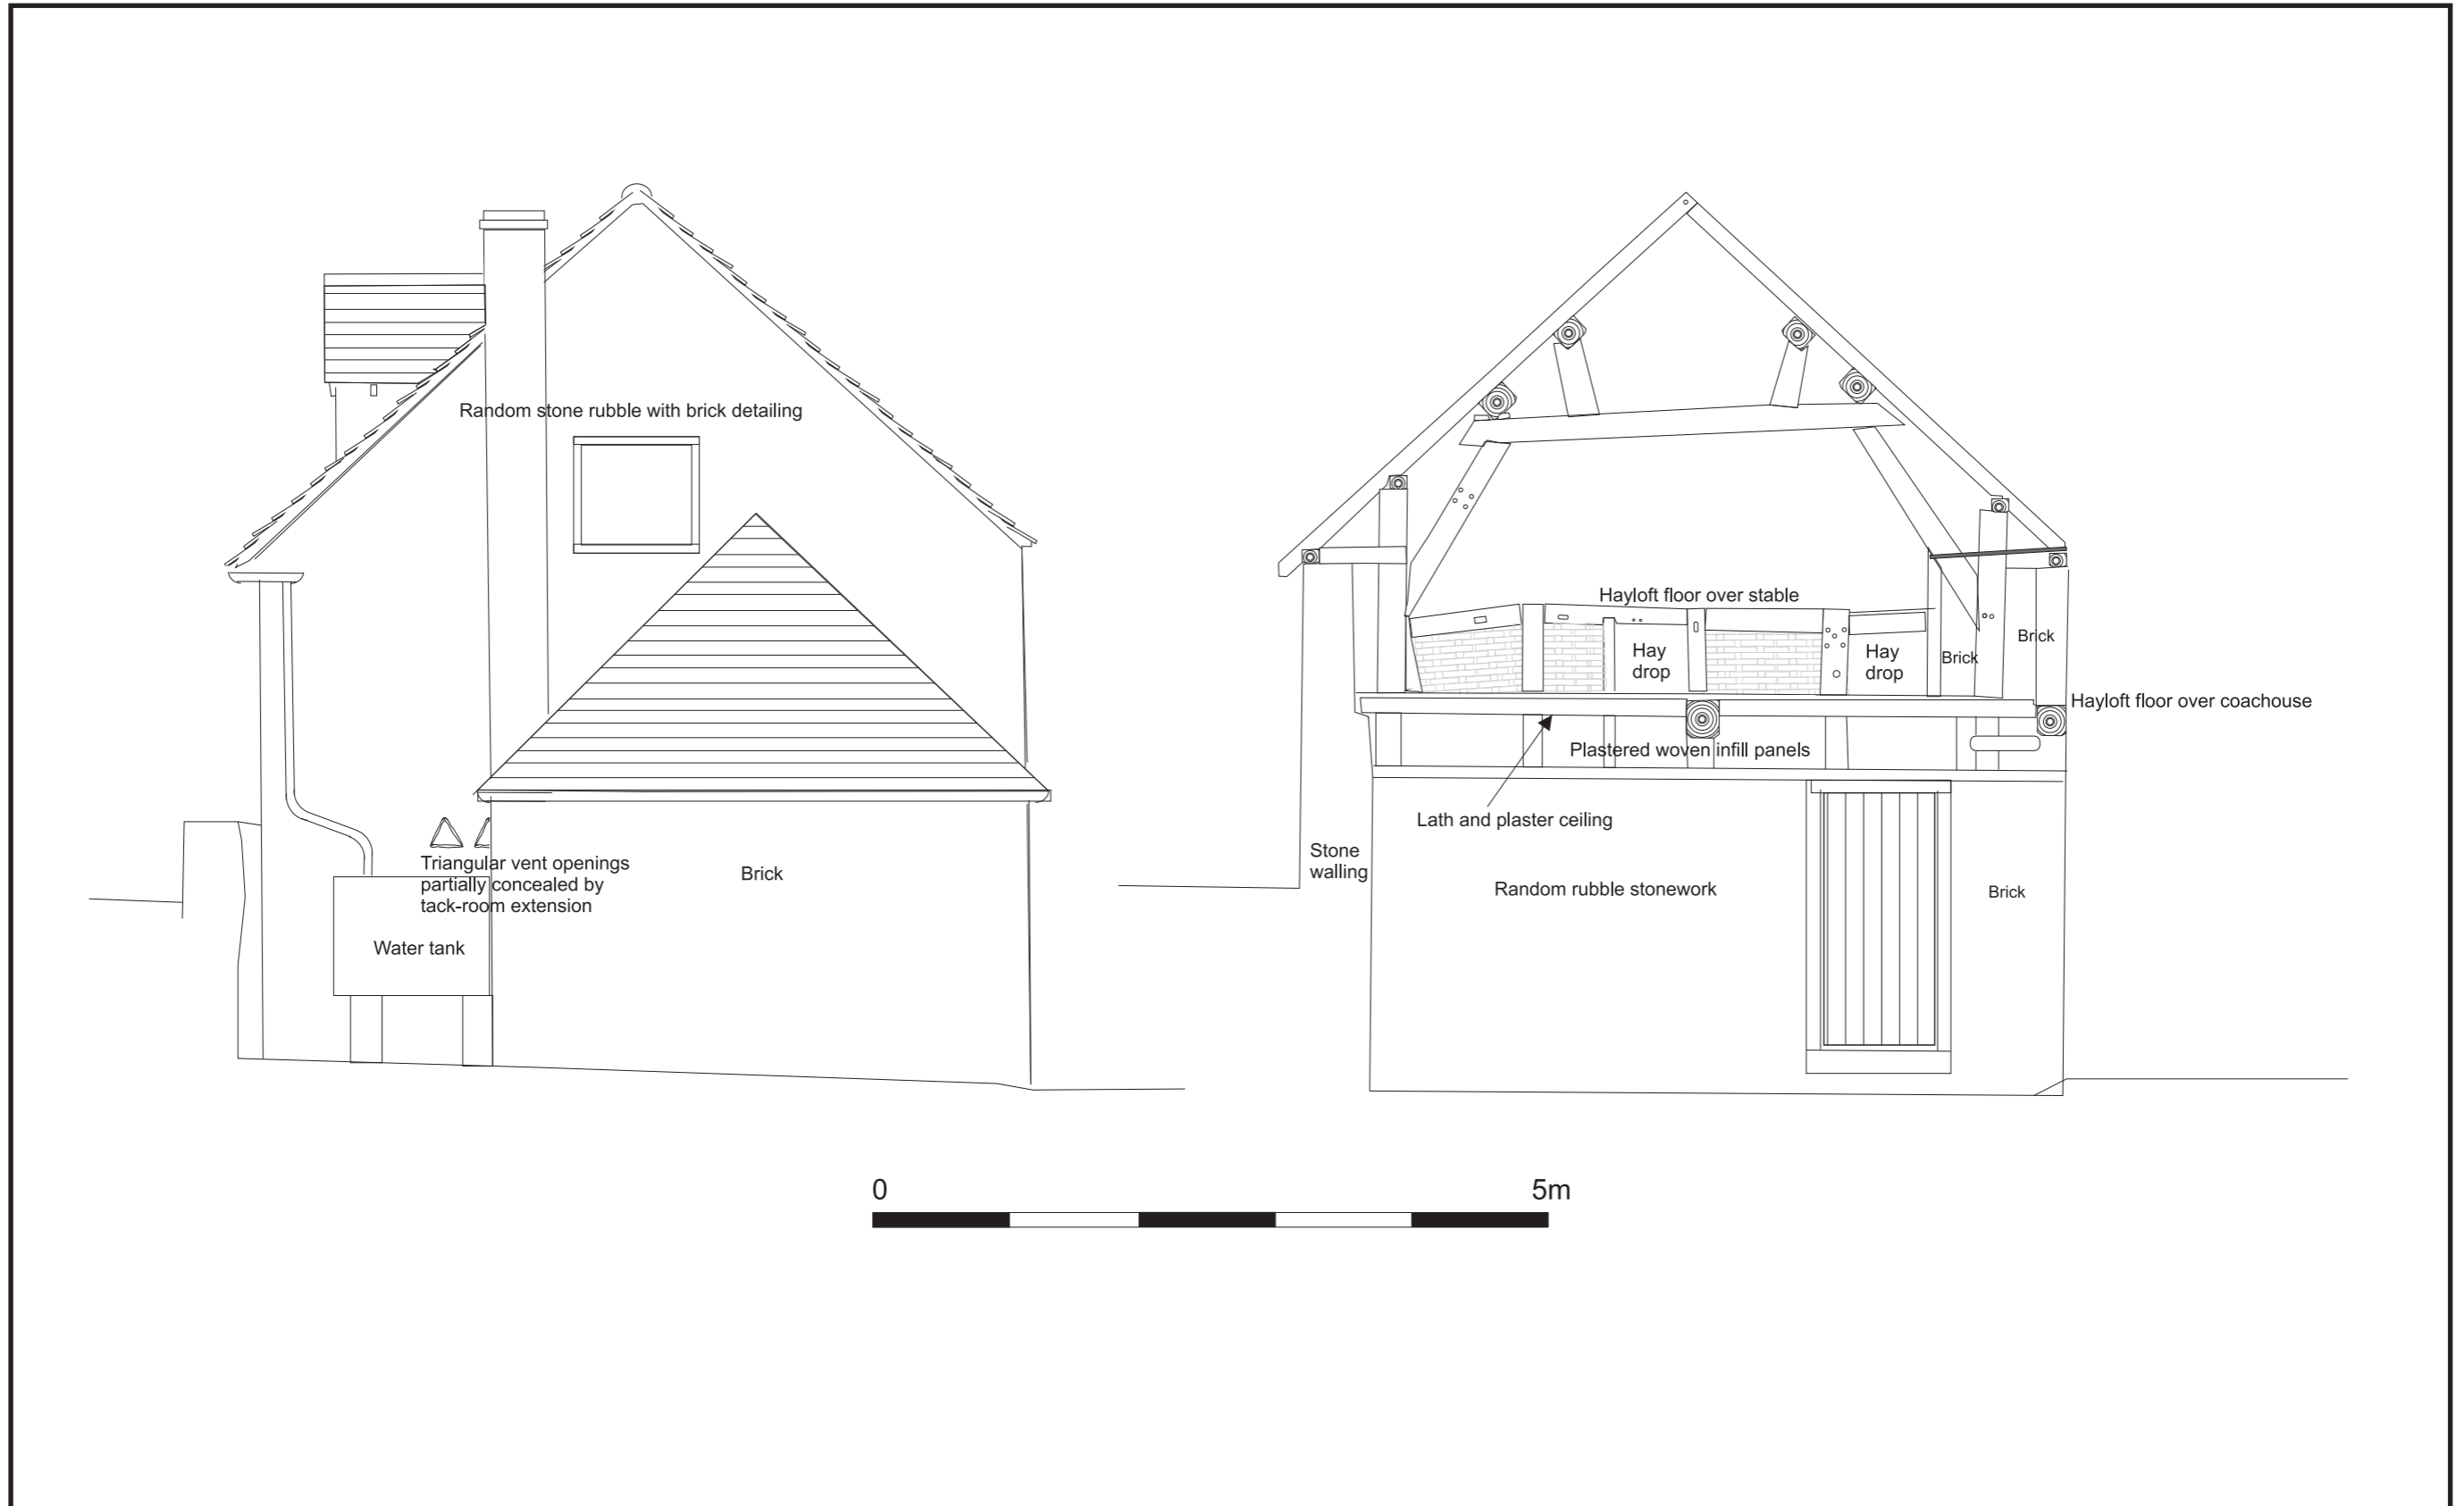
Coach-house/tack room gable end elevation and internal cross-section of coach-house
